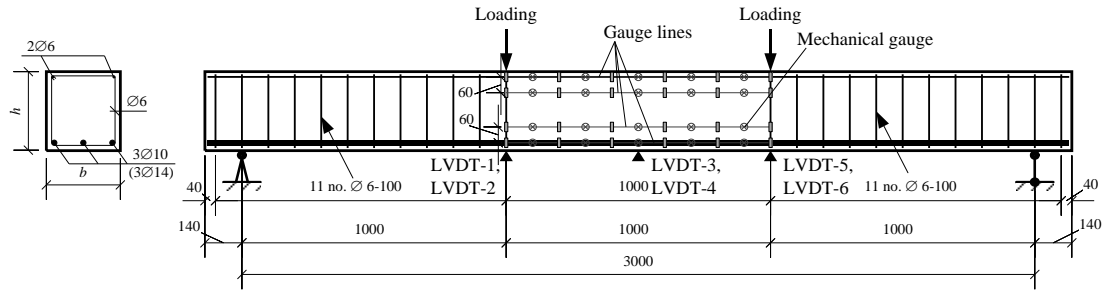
Dimensions and reinforcement layout of beams (dimensions in mm)
